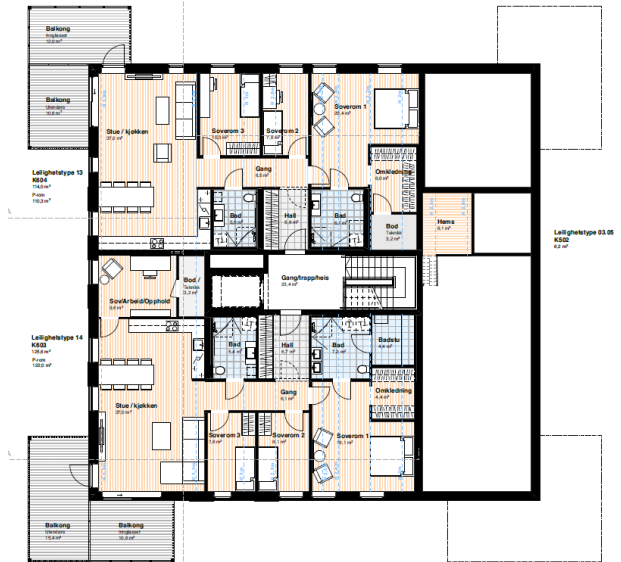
5-6 floor plan, Verket Panorama demonstration project
